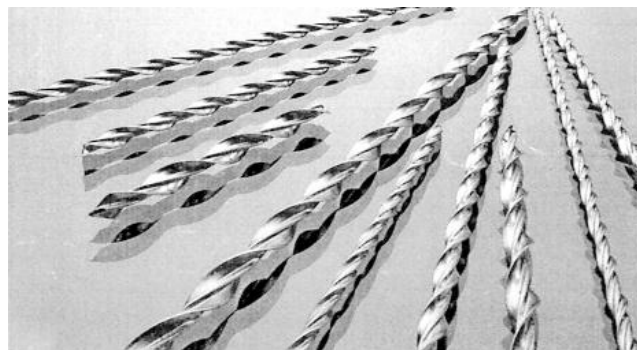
Spiral rods used to repair cracked masonry walls.
